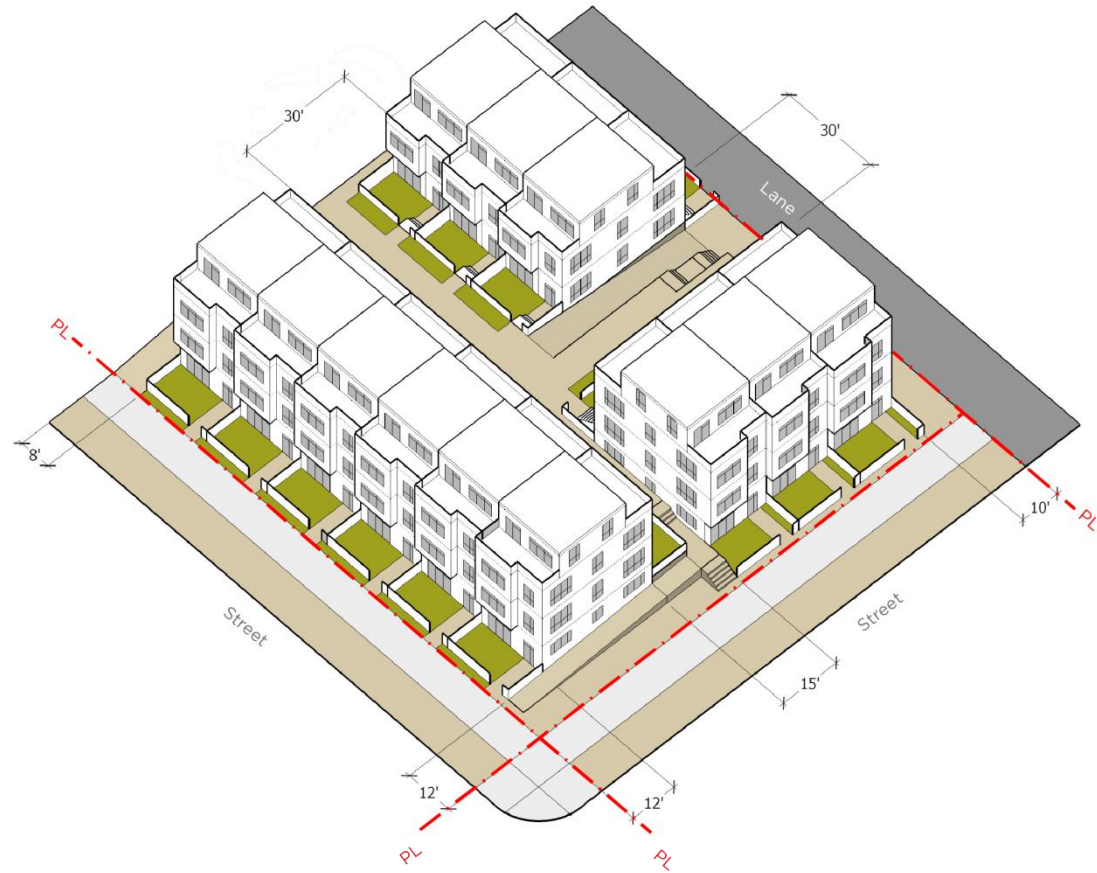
Corner site – Example Side-By-Side Or Stacked Townhouse in a Courtyard Configuration ~~Rowhouse or (Courtyard) Stacked Townhouse~~
